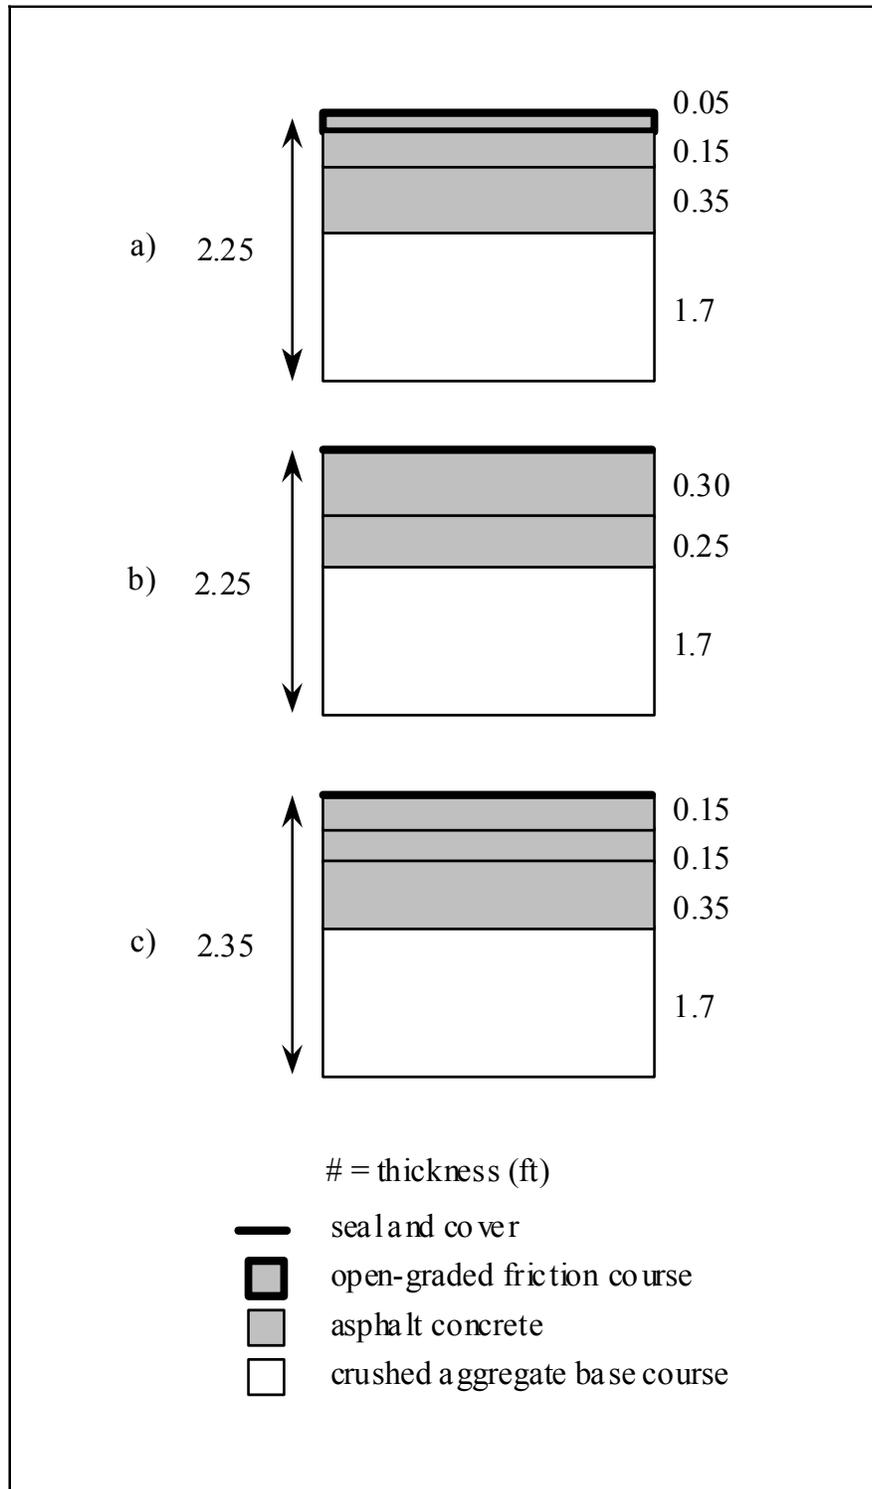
Pavement Cross-Sections at Bearmouth-Drummond:
